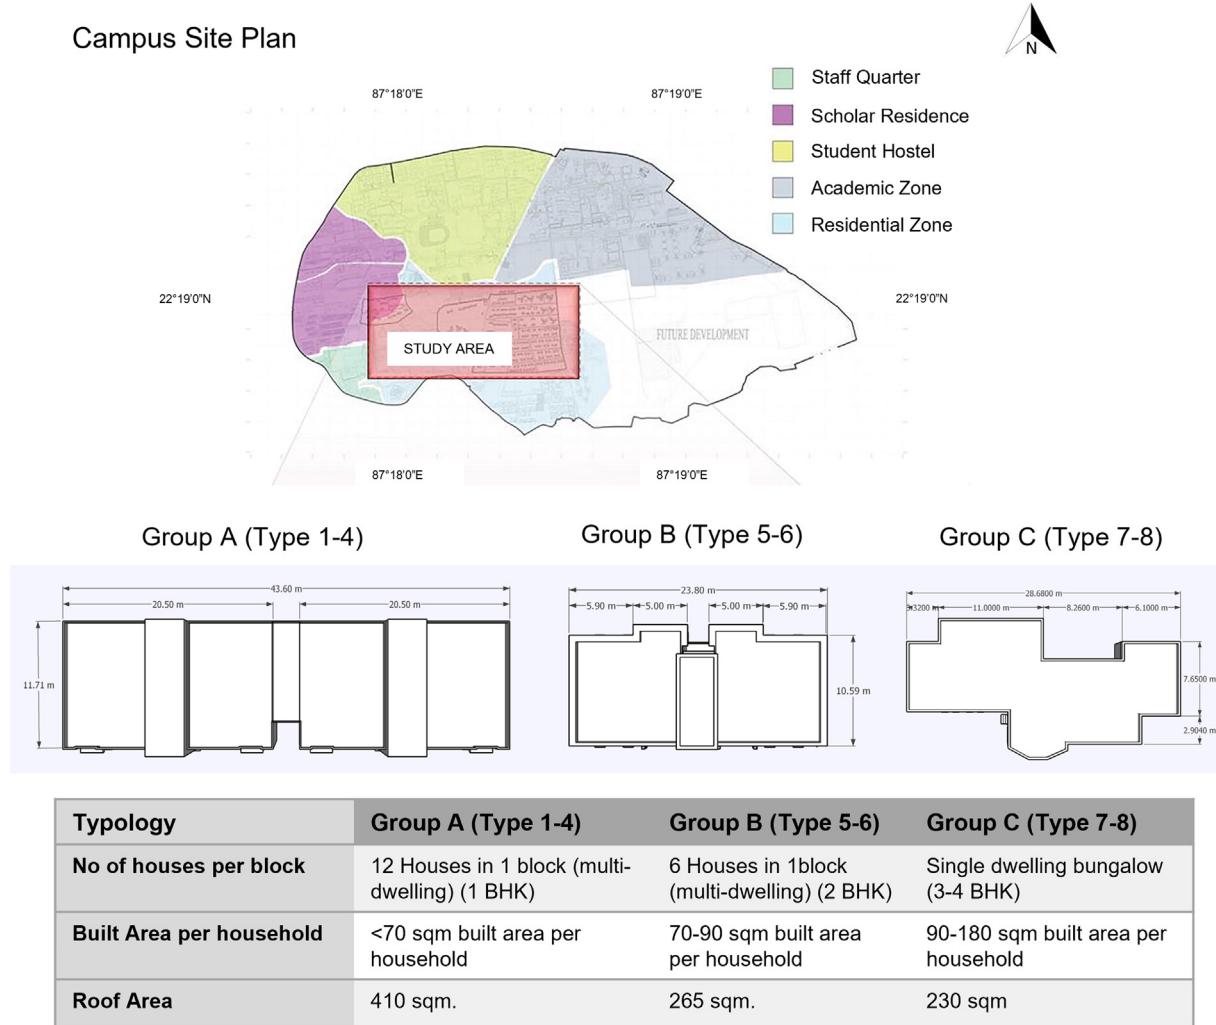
Site Plan of university campus highlighting the studied Residential Blocks.
